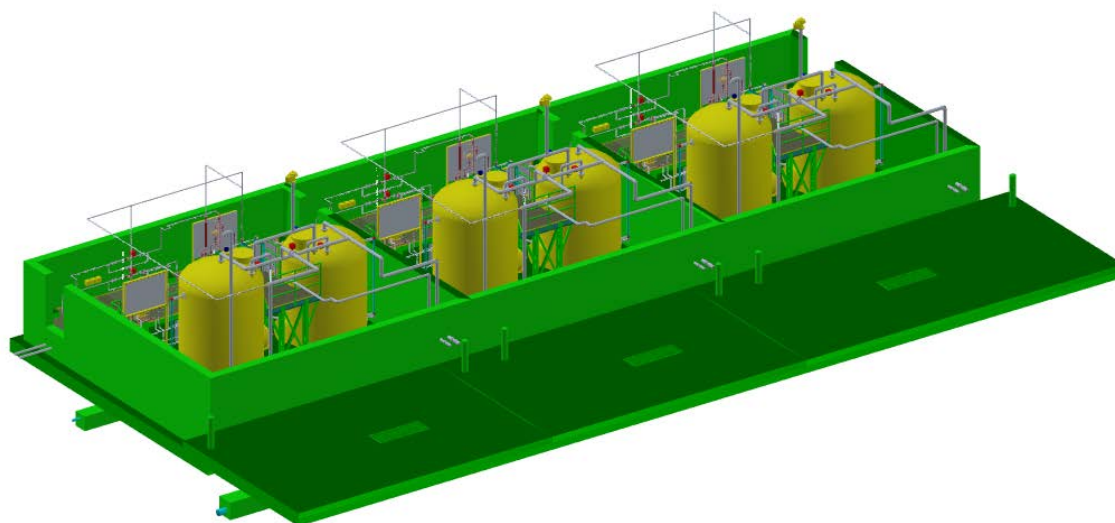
Proposed layout for the Chemical Storage Facility.
